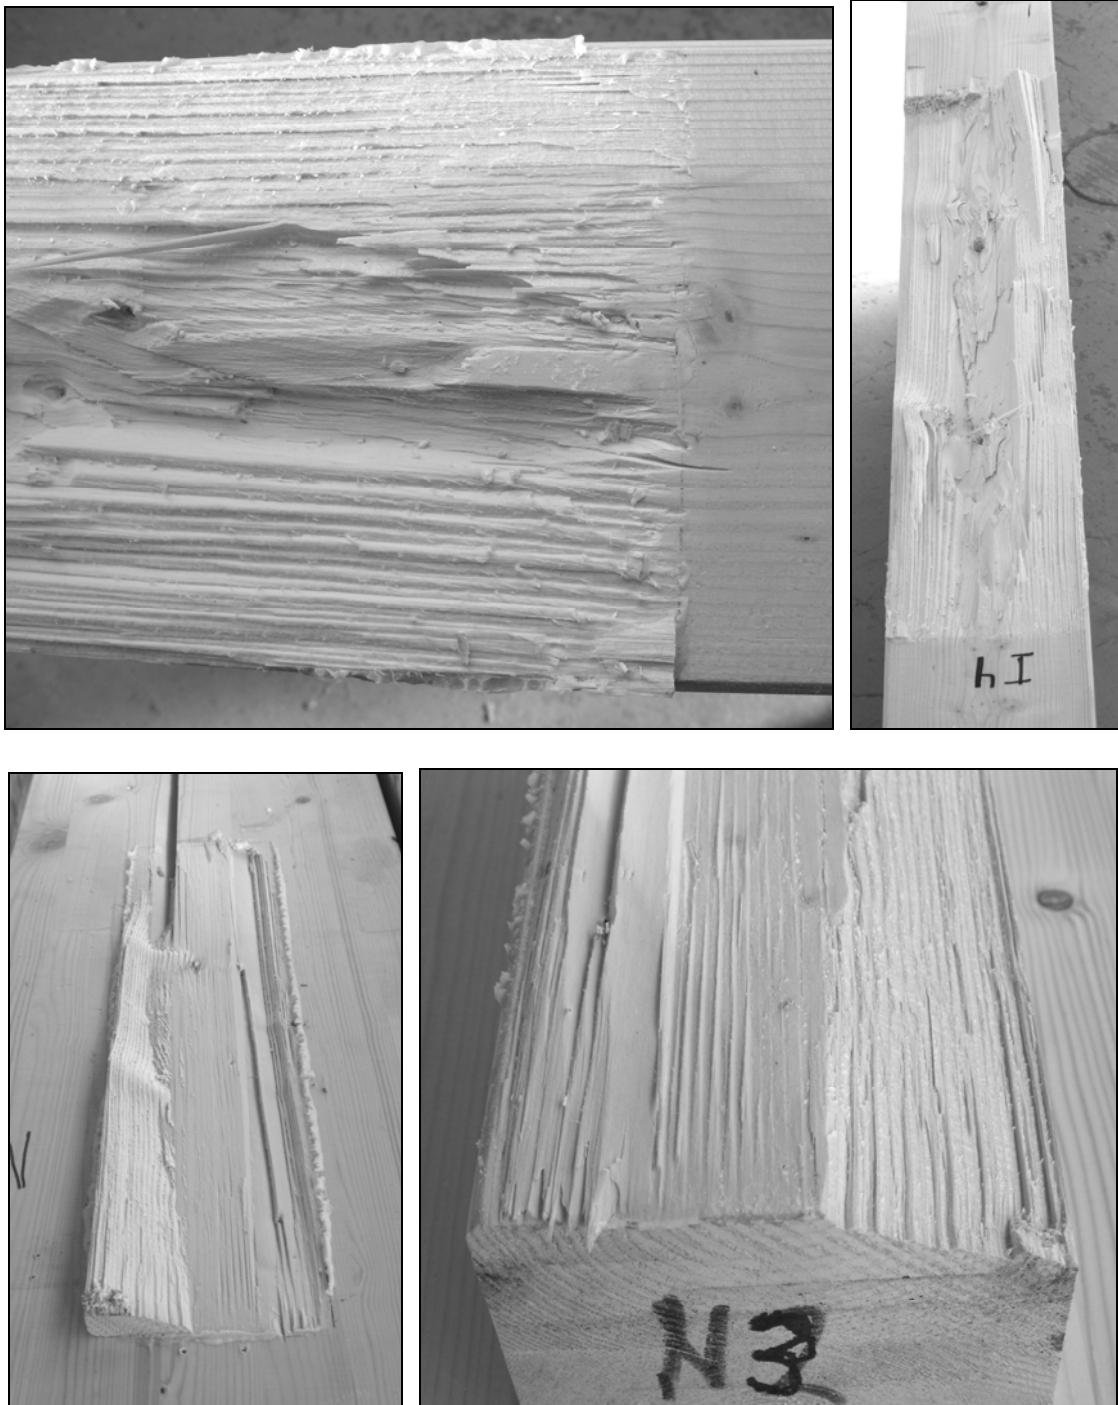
Beam side of specimen i4 (upper left and right) and beam side (lower left) and cleat side (lower right) of n3.
